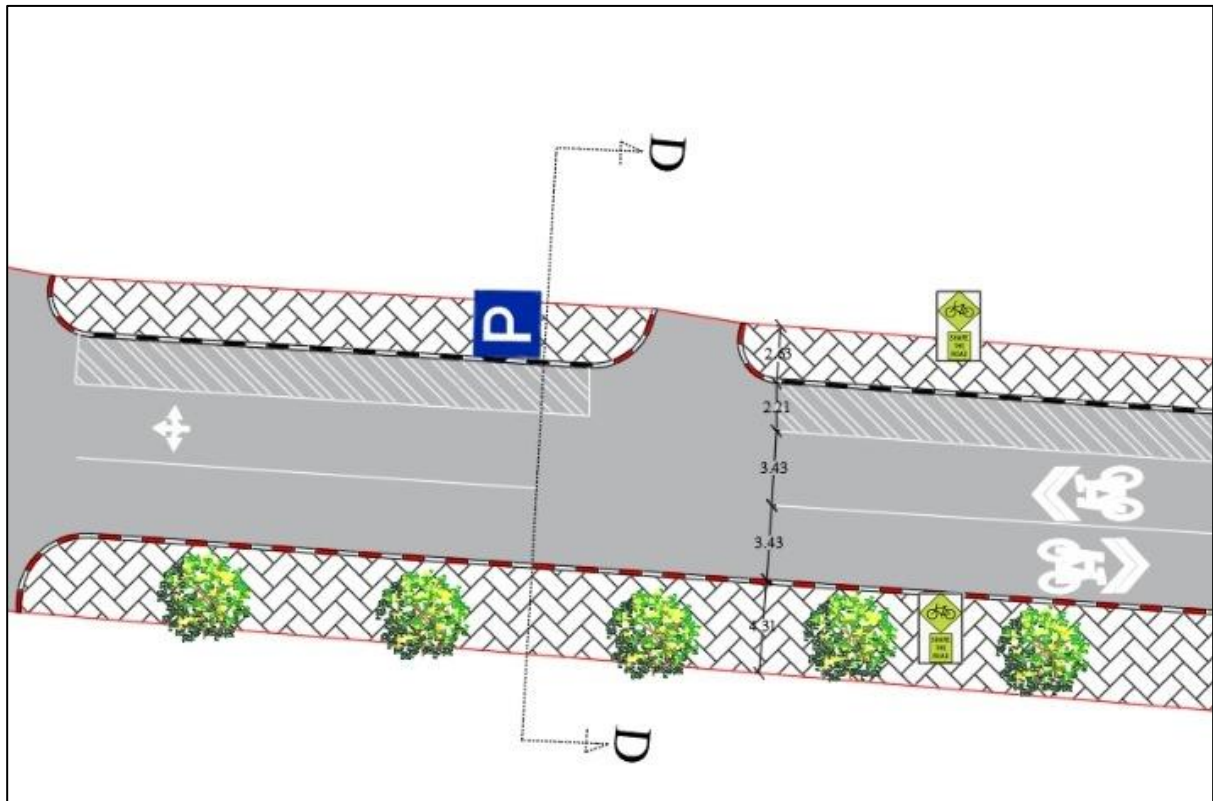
12: Plan Drawing Section D-D, Omar Ibn Al-Khattab Street, An-Najah Old Campus
